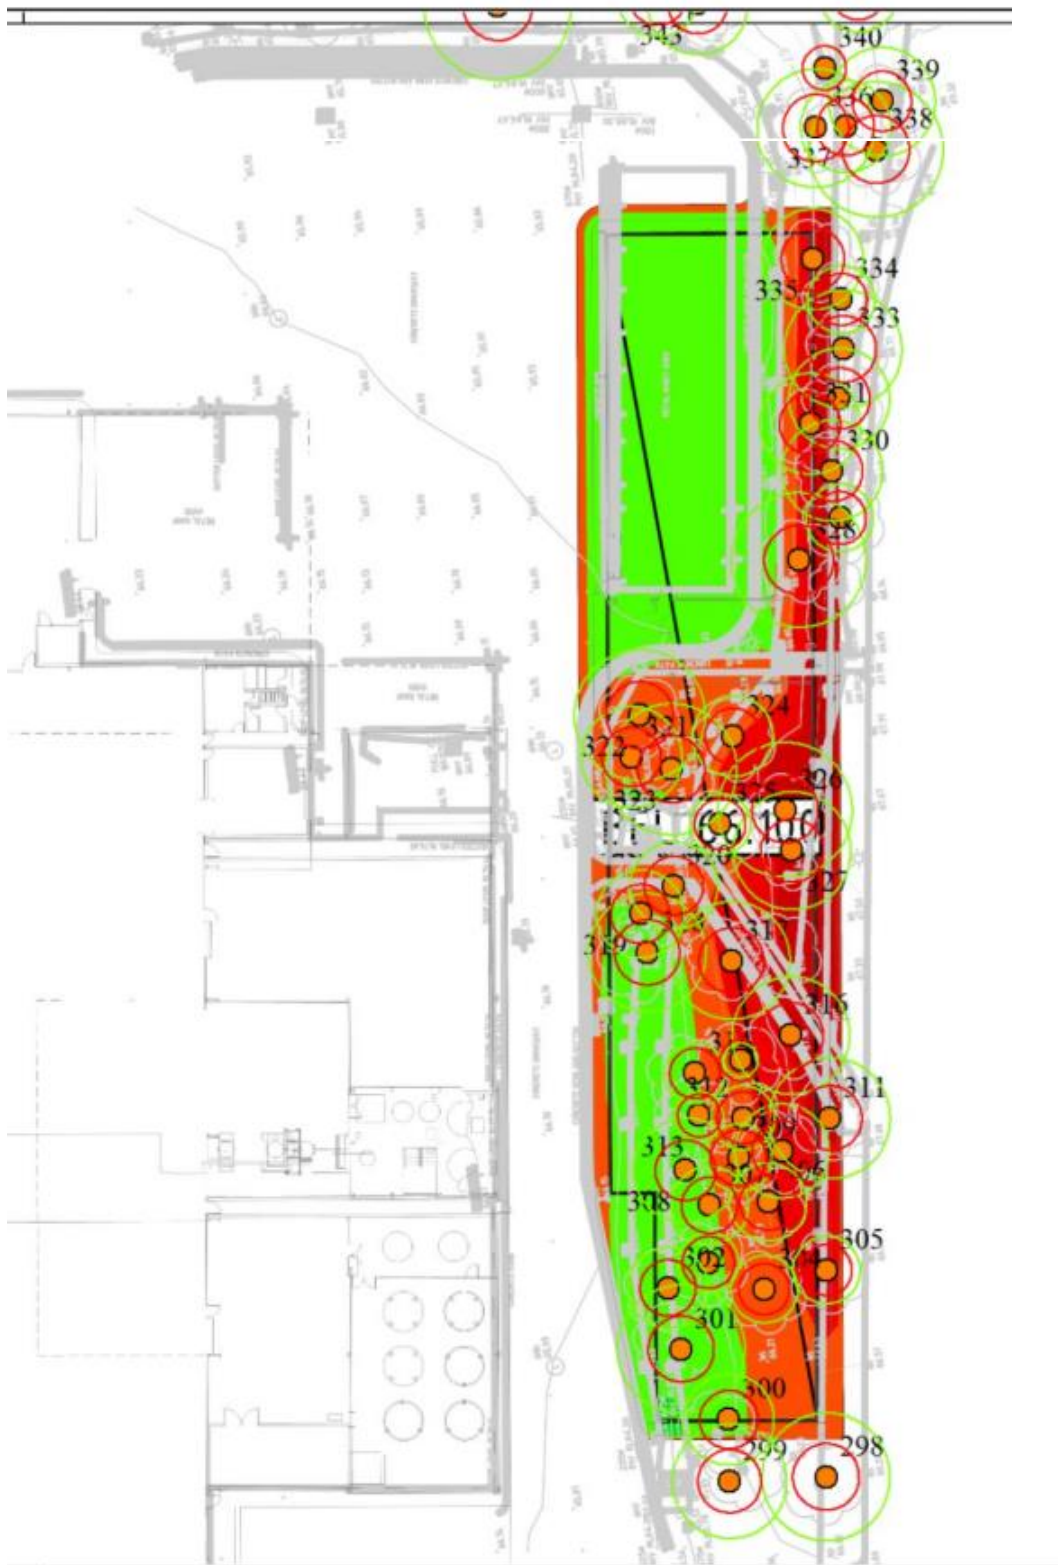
Tree locations overlaid on the cut & fill plan for the proposed building in the south-eastern corner of the development site.
